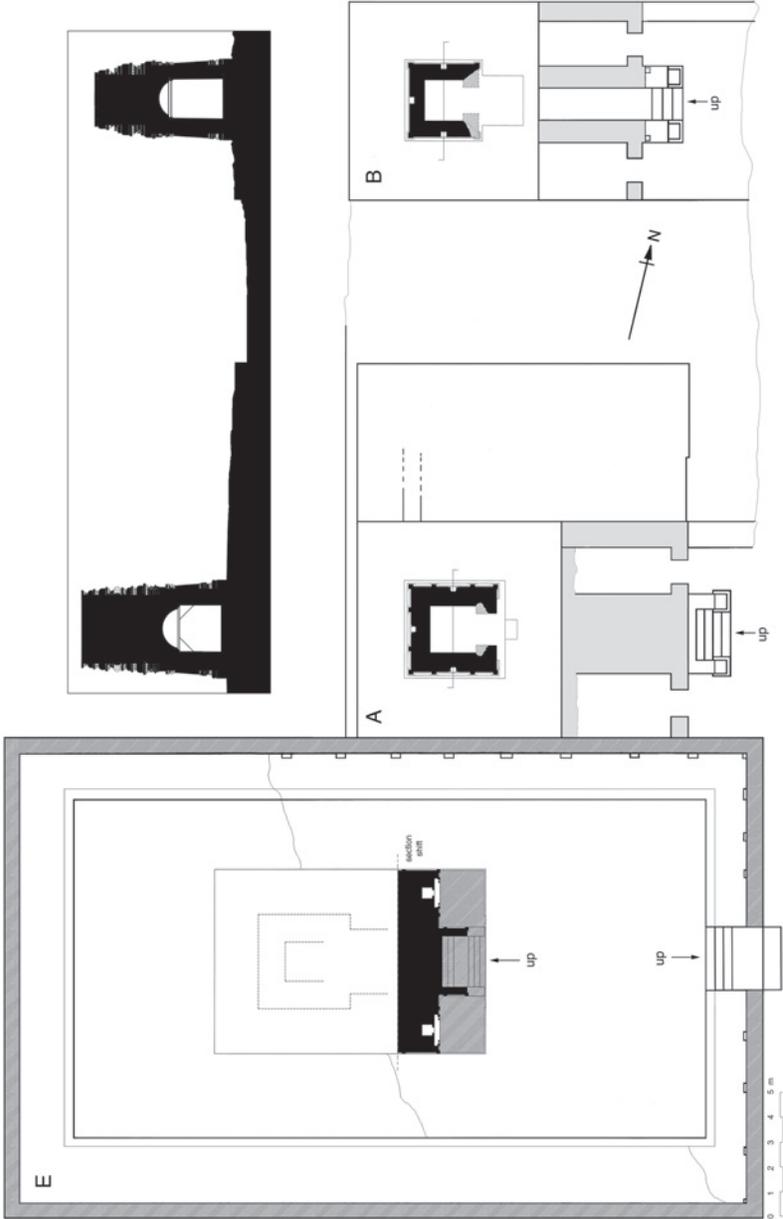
Kāfirkoṭ, Temples E, A, and B, site plan; sections of A and B.
